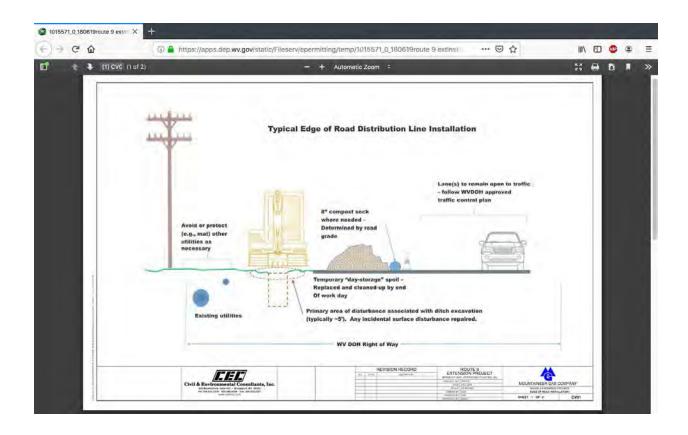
EXHIBIT XX - CONSTRUCTION METHOD FOR EDGE OF ROAD (LONGITUDINAL) PIPELINE INSTALLATIONS
